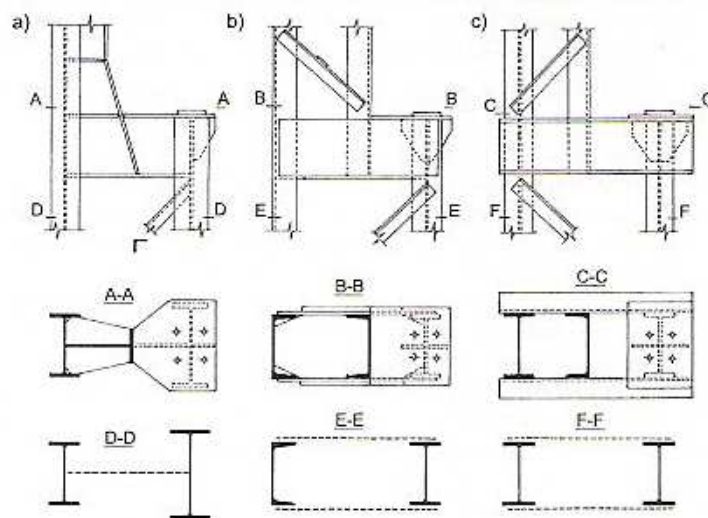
Examples of two-arm columns with changes in cross-sections
